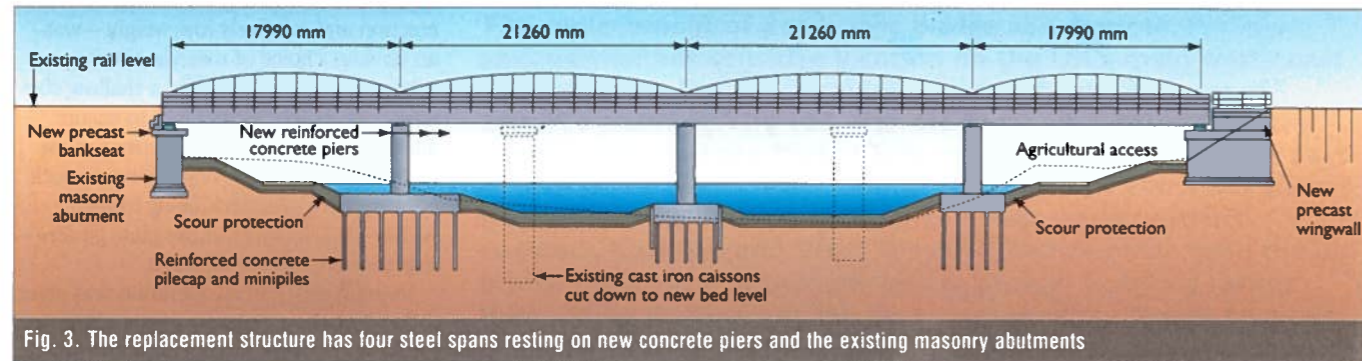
The replacement structure has four steel spans resting on new concrete piers and the existing masonry abutments
